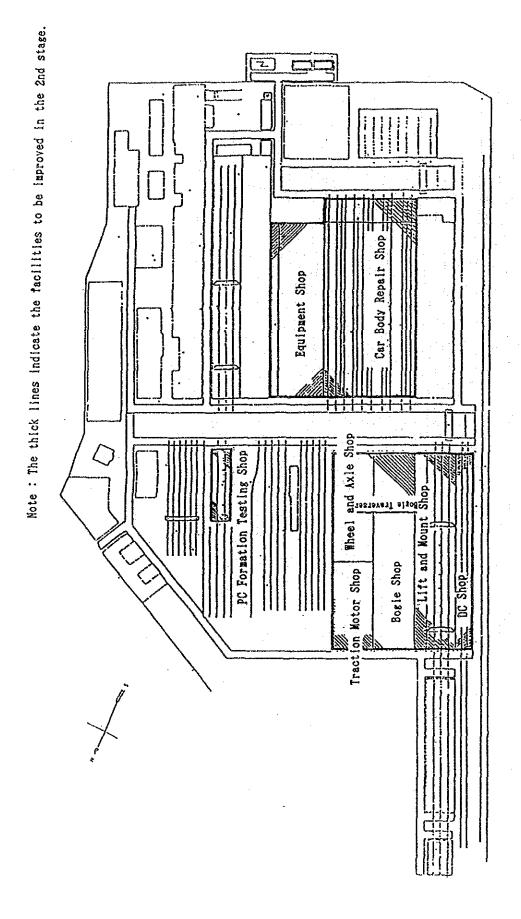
Layout of Improvement Plan for Manggarai Workshop
